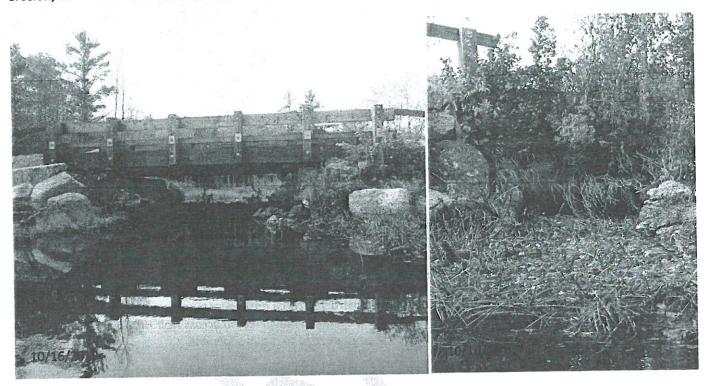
Beaver dam under new Craig Road bridge (left), with downstream water level lowered by approximately 16 inches after removal of flash boards at Gregg Lake dam. Bank erosion and probable sinkhole drainage site (arrow) at high water level made visible by low water level.
